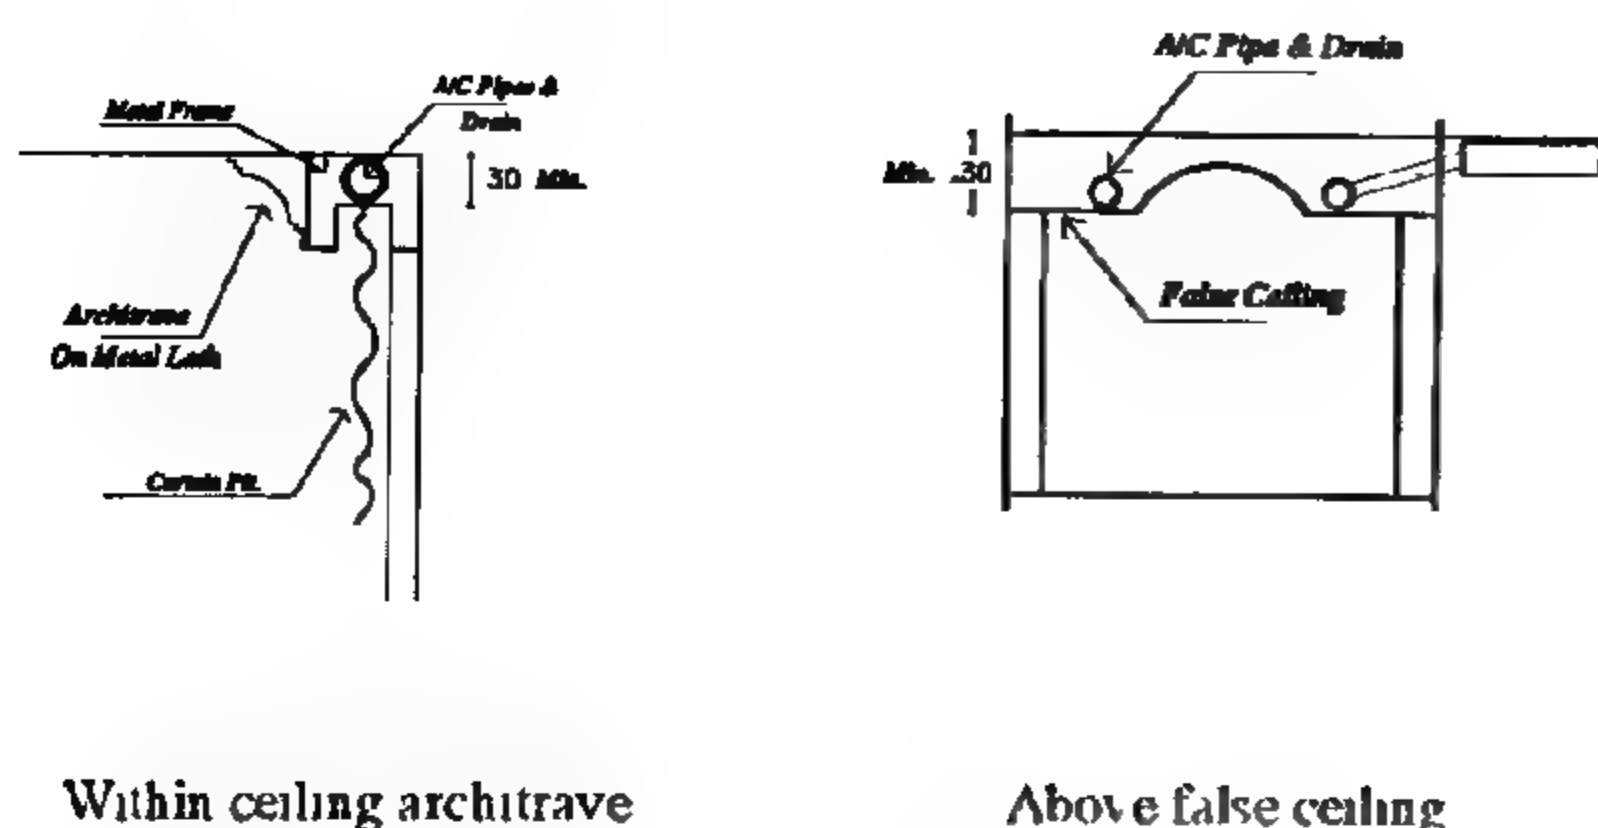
Detail of a conduit imbedded within ceiling architrave or above false ceiling
